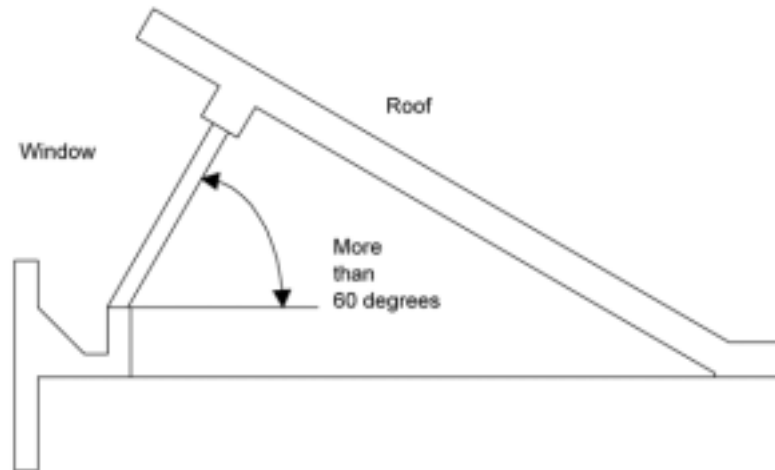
Slope of a Wall or Window (Roof or Skylight slope is less than 60°)
